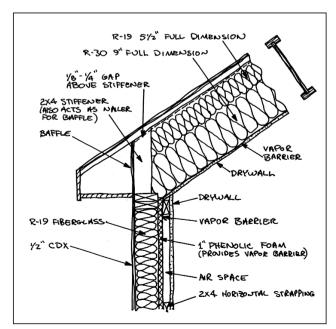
Sixteen-inch TJI rafters will accept an R-50 layer of fiberglass batts. Here, the ceiling vapor barrier is taped to the rigid foam on the walls.
